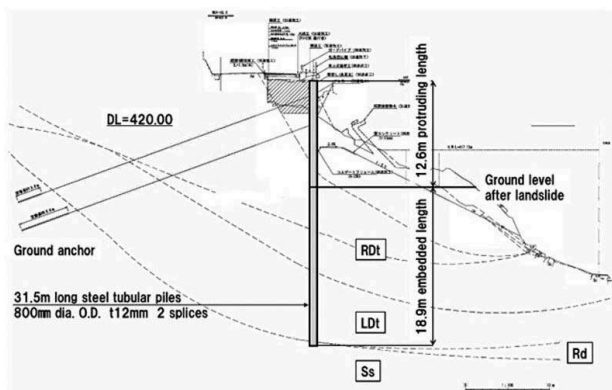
Typical cross section of the installation of tubular piles with ground anchors.
